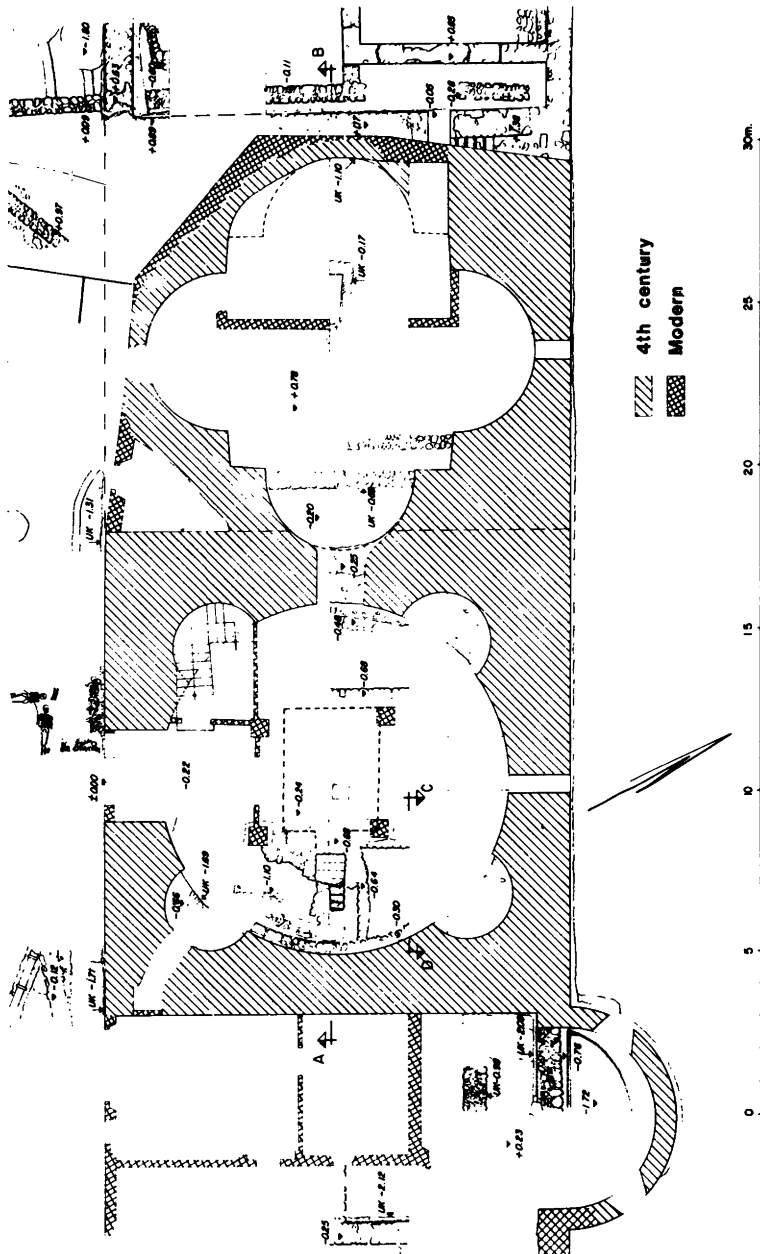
Groundfloor of the architectural remains excavated in Centelles—Constantí, Tarragona (I.A.A.).
